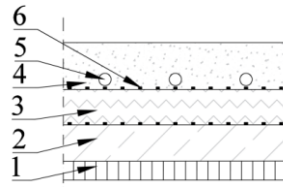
Section of a floor heating at experimental stand (1 - furniture board, 2 - B30 concrete with reinforcing mesh, 3 – thermal insulation, 4 - screed, 5 - pipe, 6 - temperature sensor)
